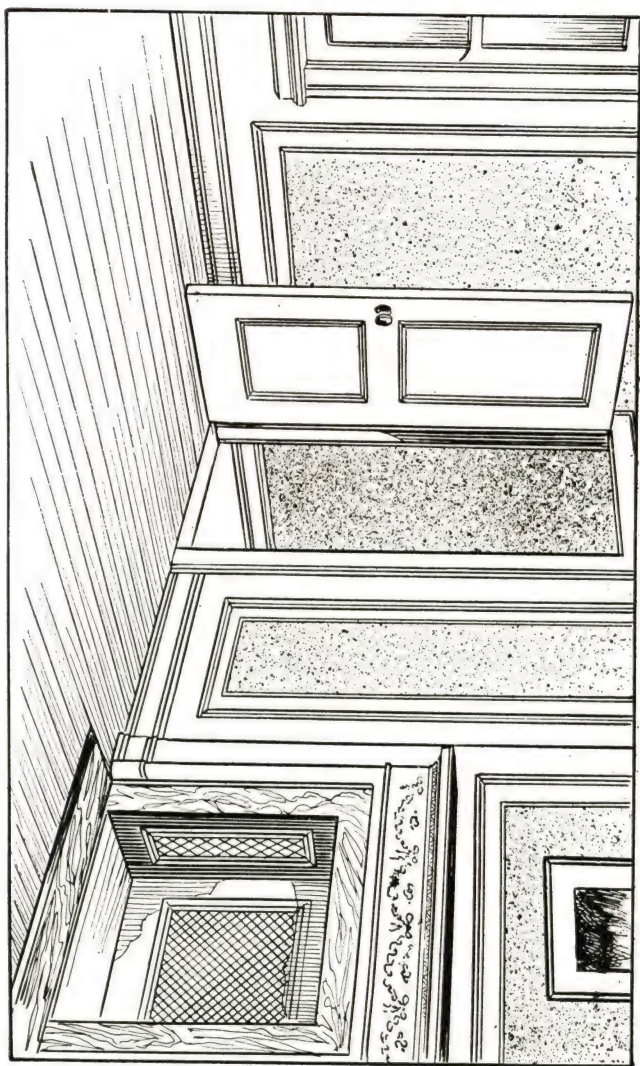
A Simple but Effective Wall Panel Layout Below a Chair Rail and Having Pictorial Wallpaper Above the Panels.
